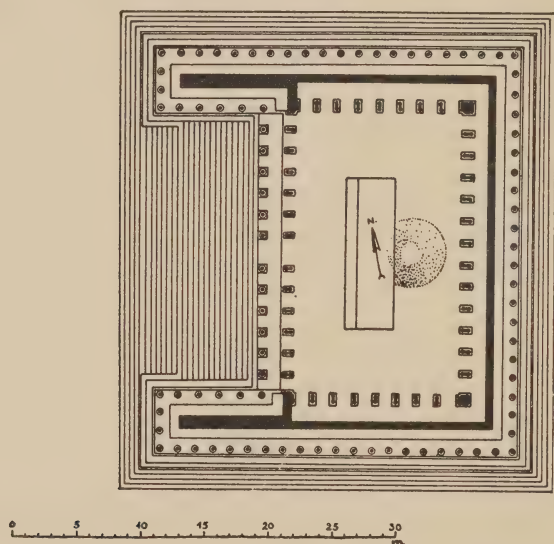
Pergamon. Colossal altar, reconstructed plan.
